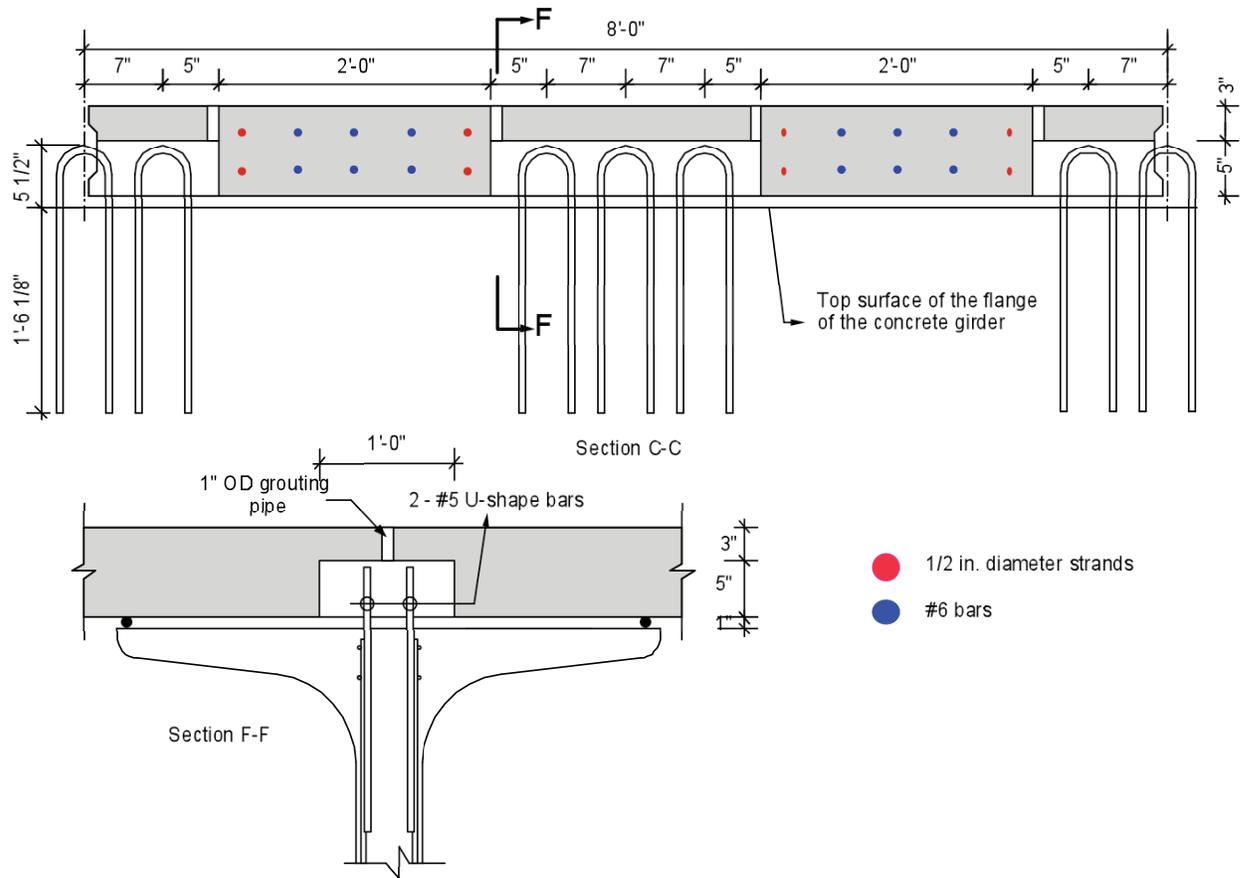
Sections C – C and E – E for precast girder panels.
